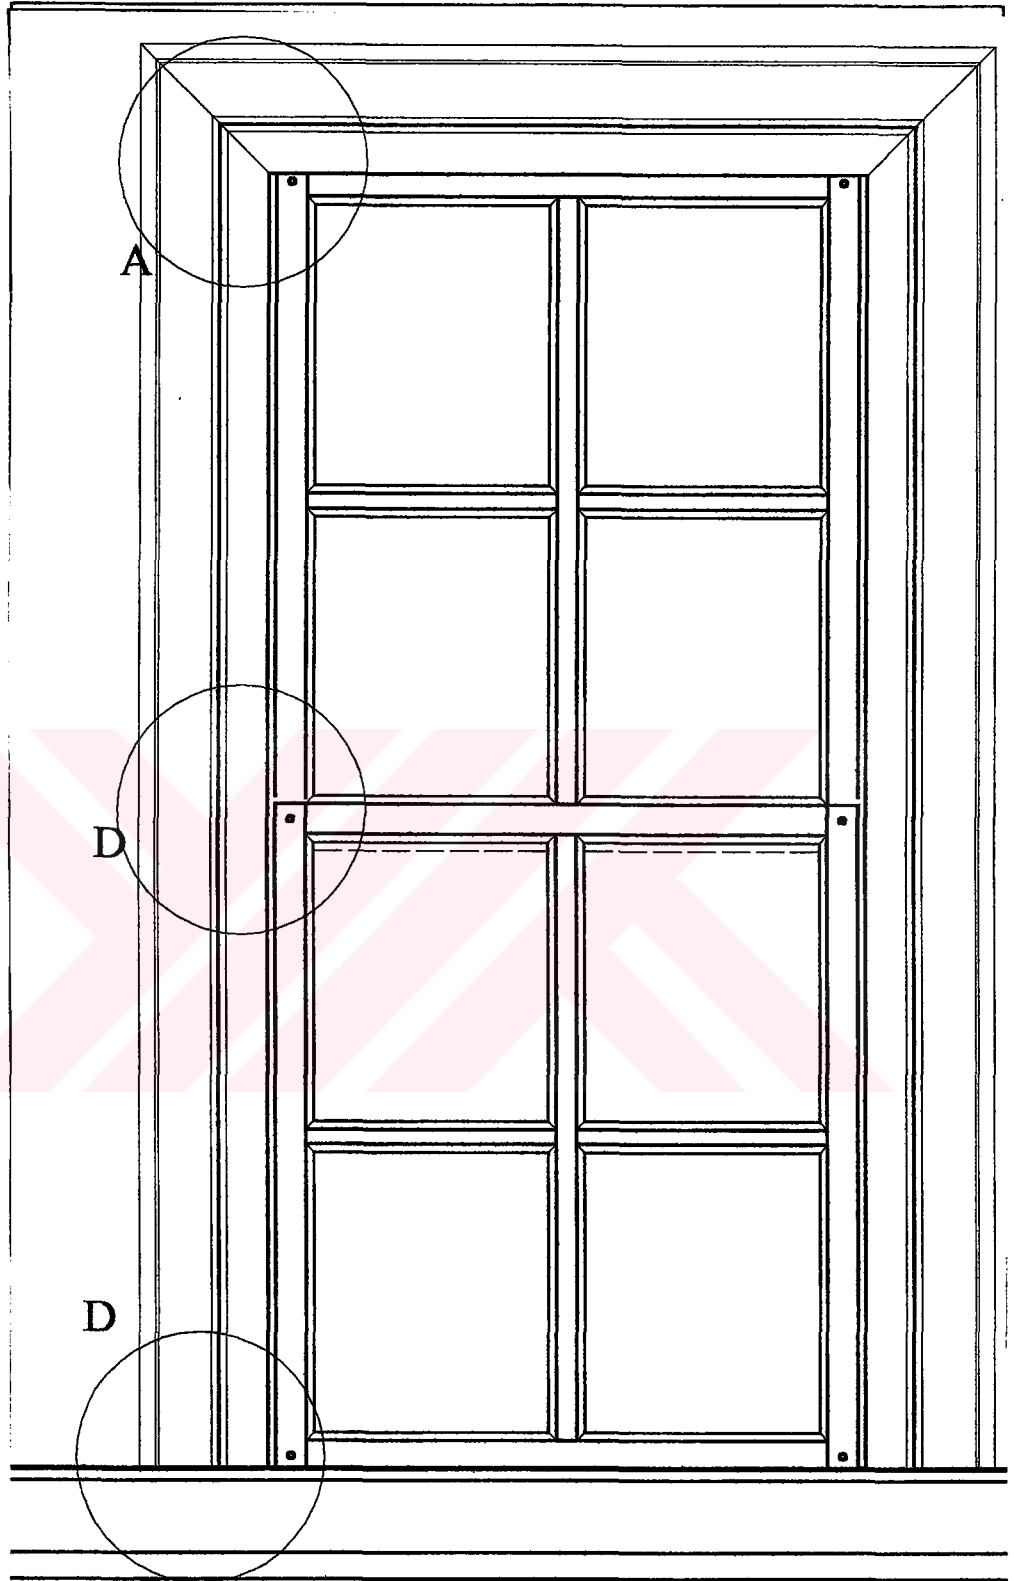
W03B Recommendations – Exterior Elevation
